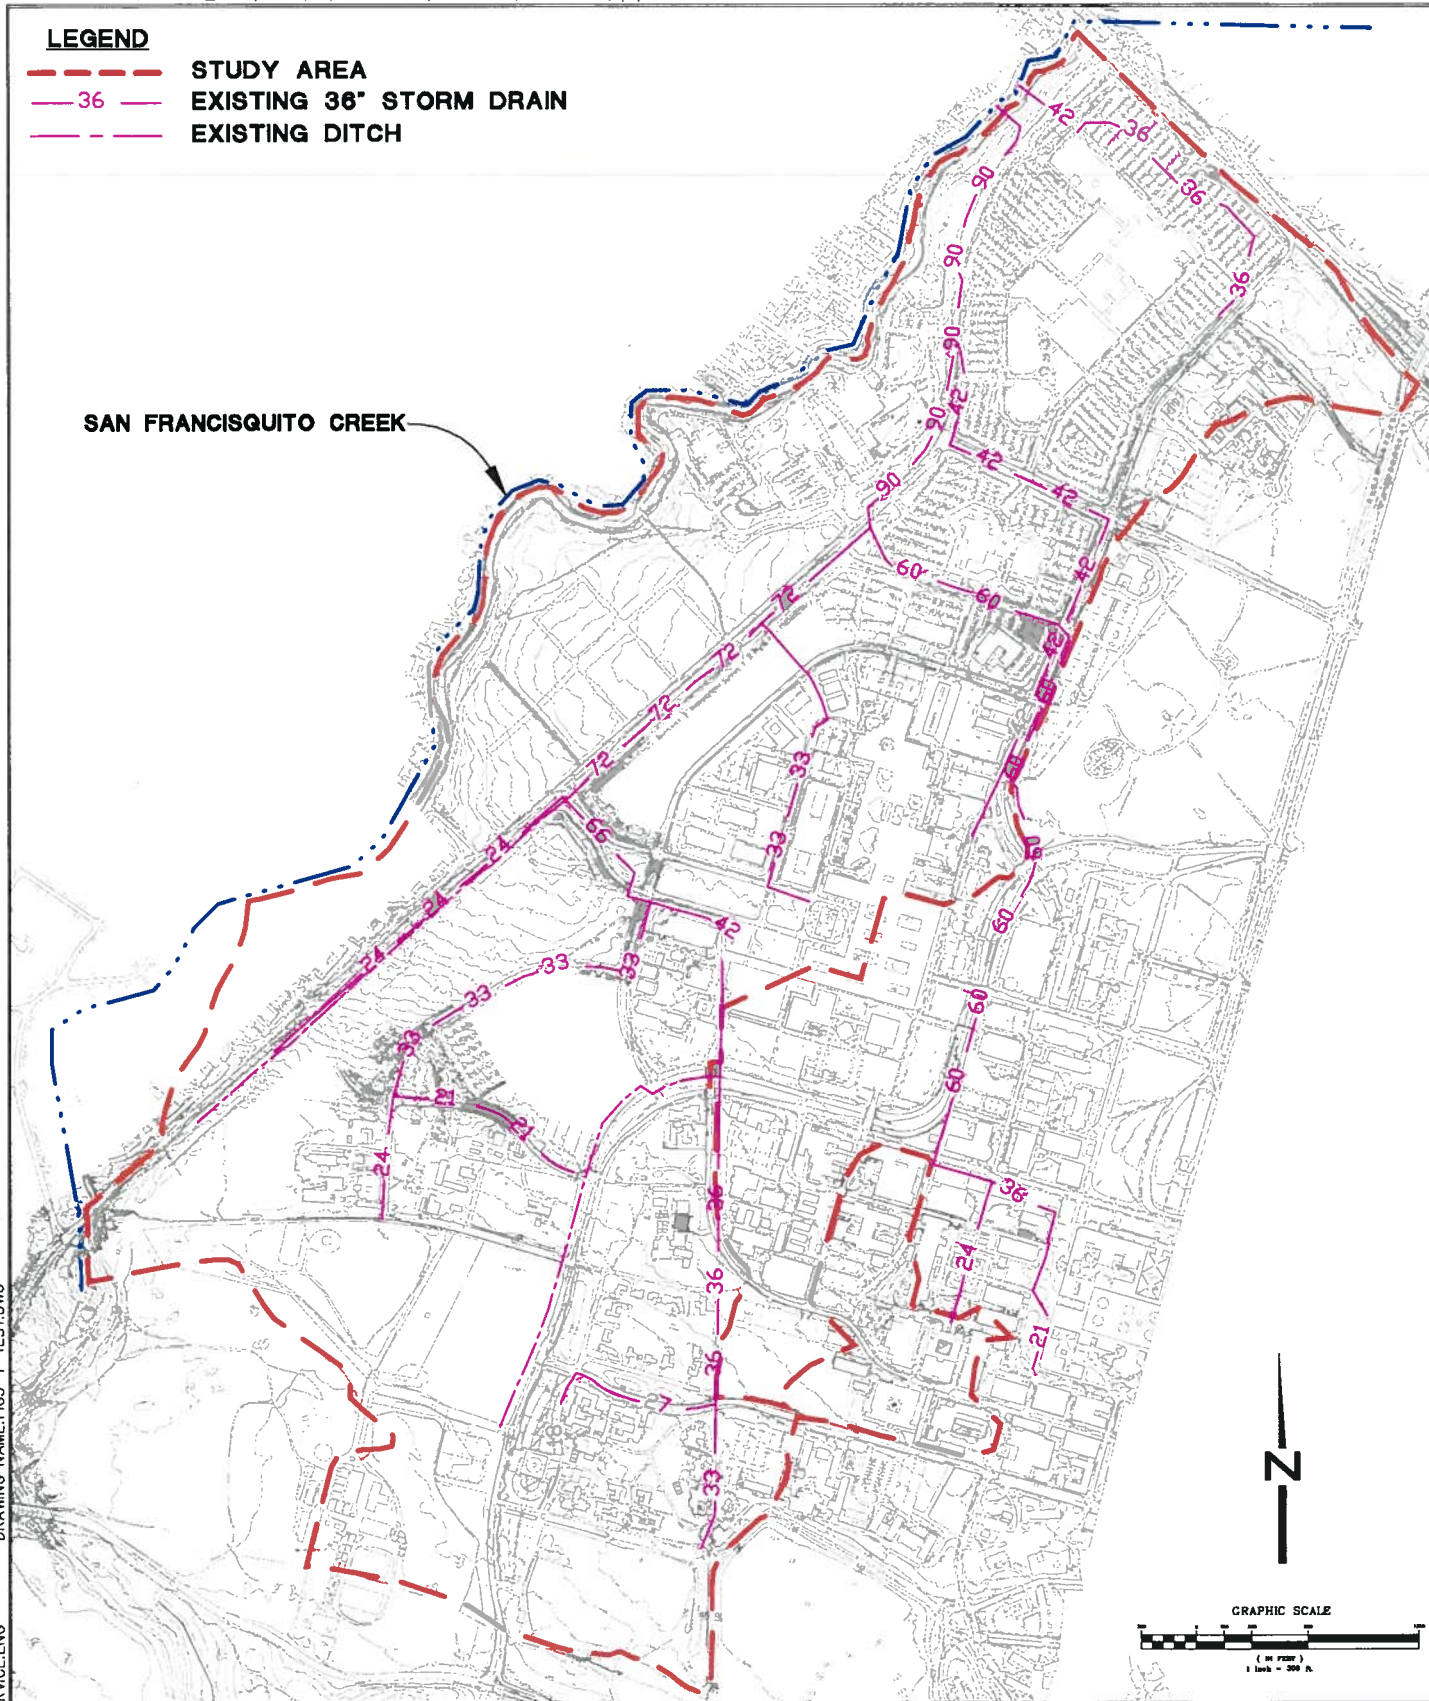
PIPE STORM DRAINAGE SYSTEM
